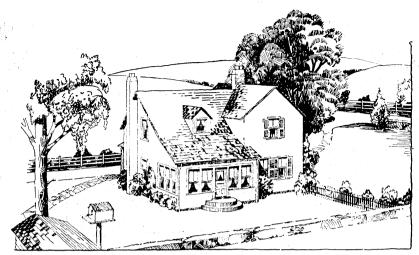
Sun room view of house 16, according to suggested remodeling plan.
